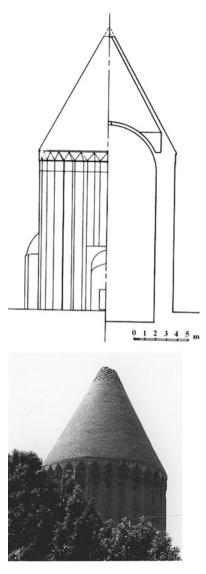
Varamin. Ala ad-Din tomb tower, a double-conical dome (façade—section from Wilber)
